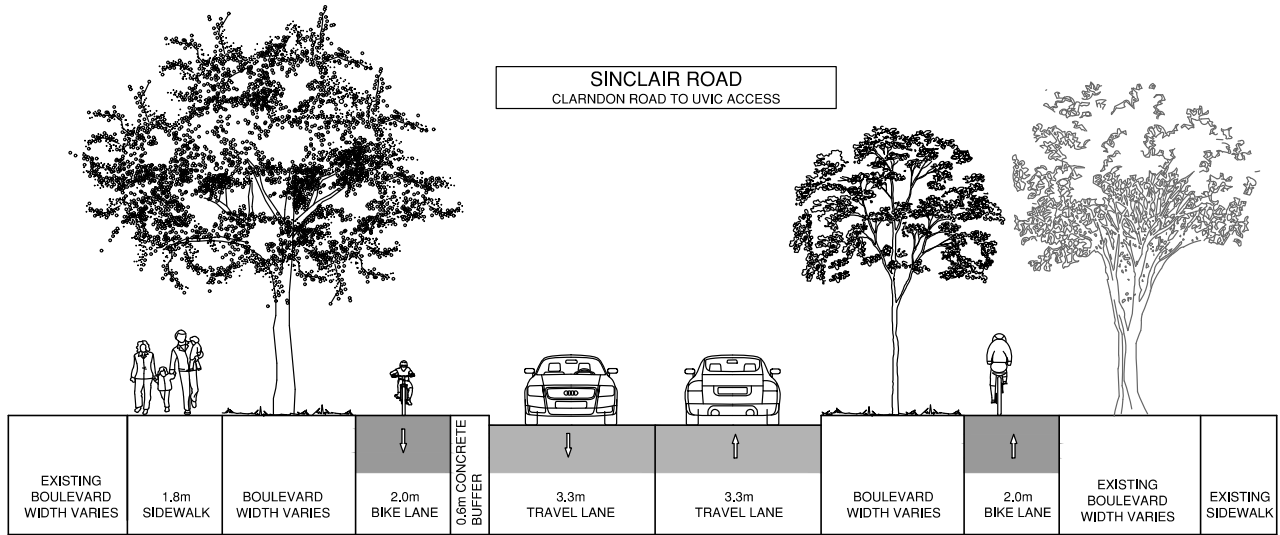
Sinclair Road Design Concept - Upper Section (Segment 1)
